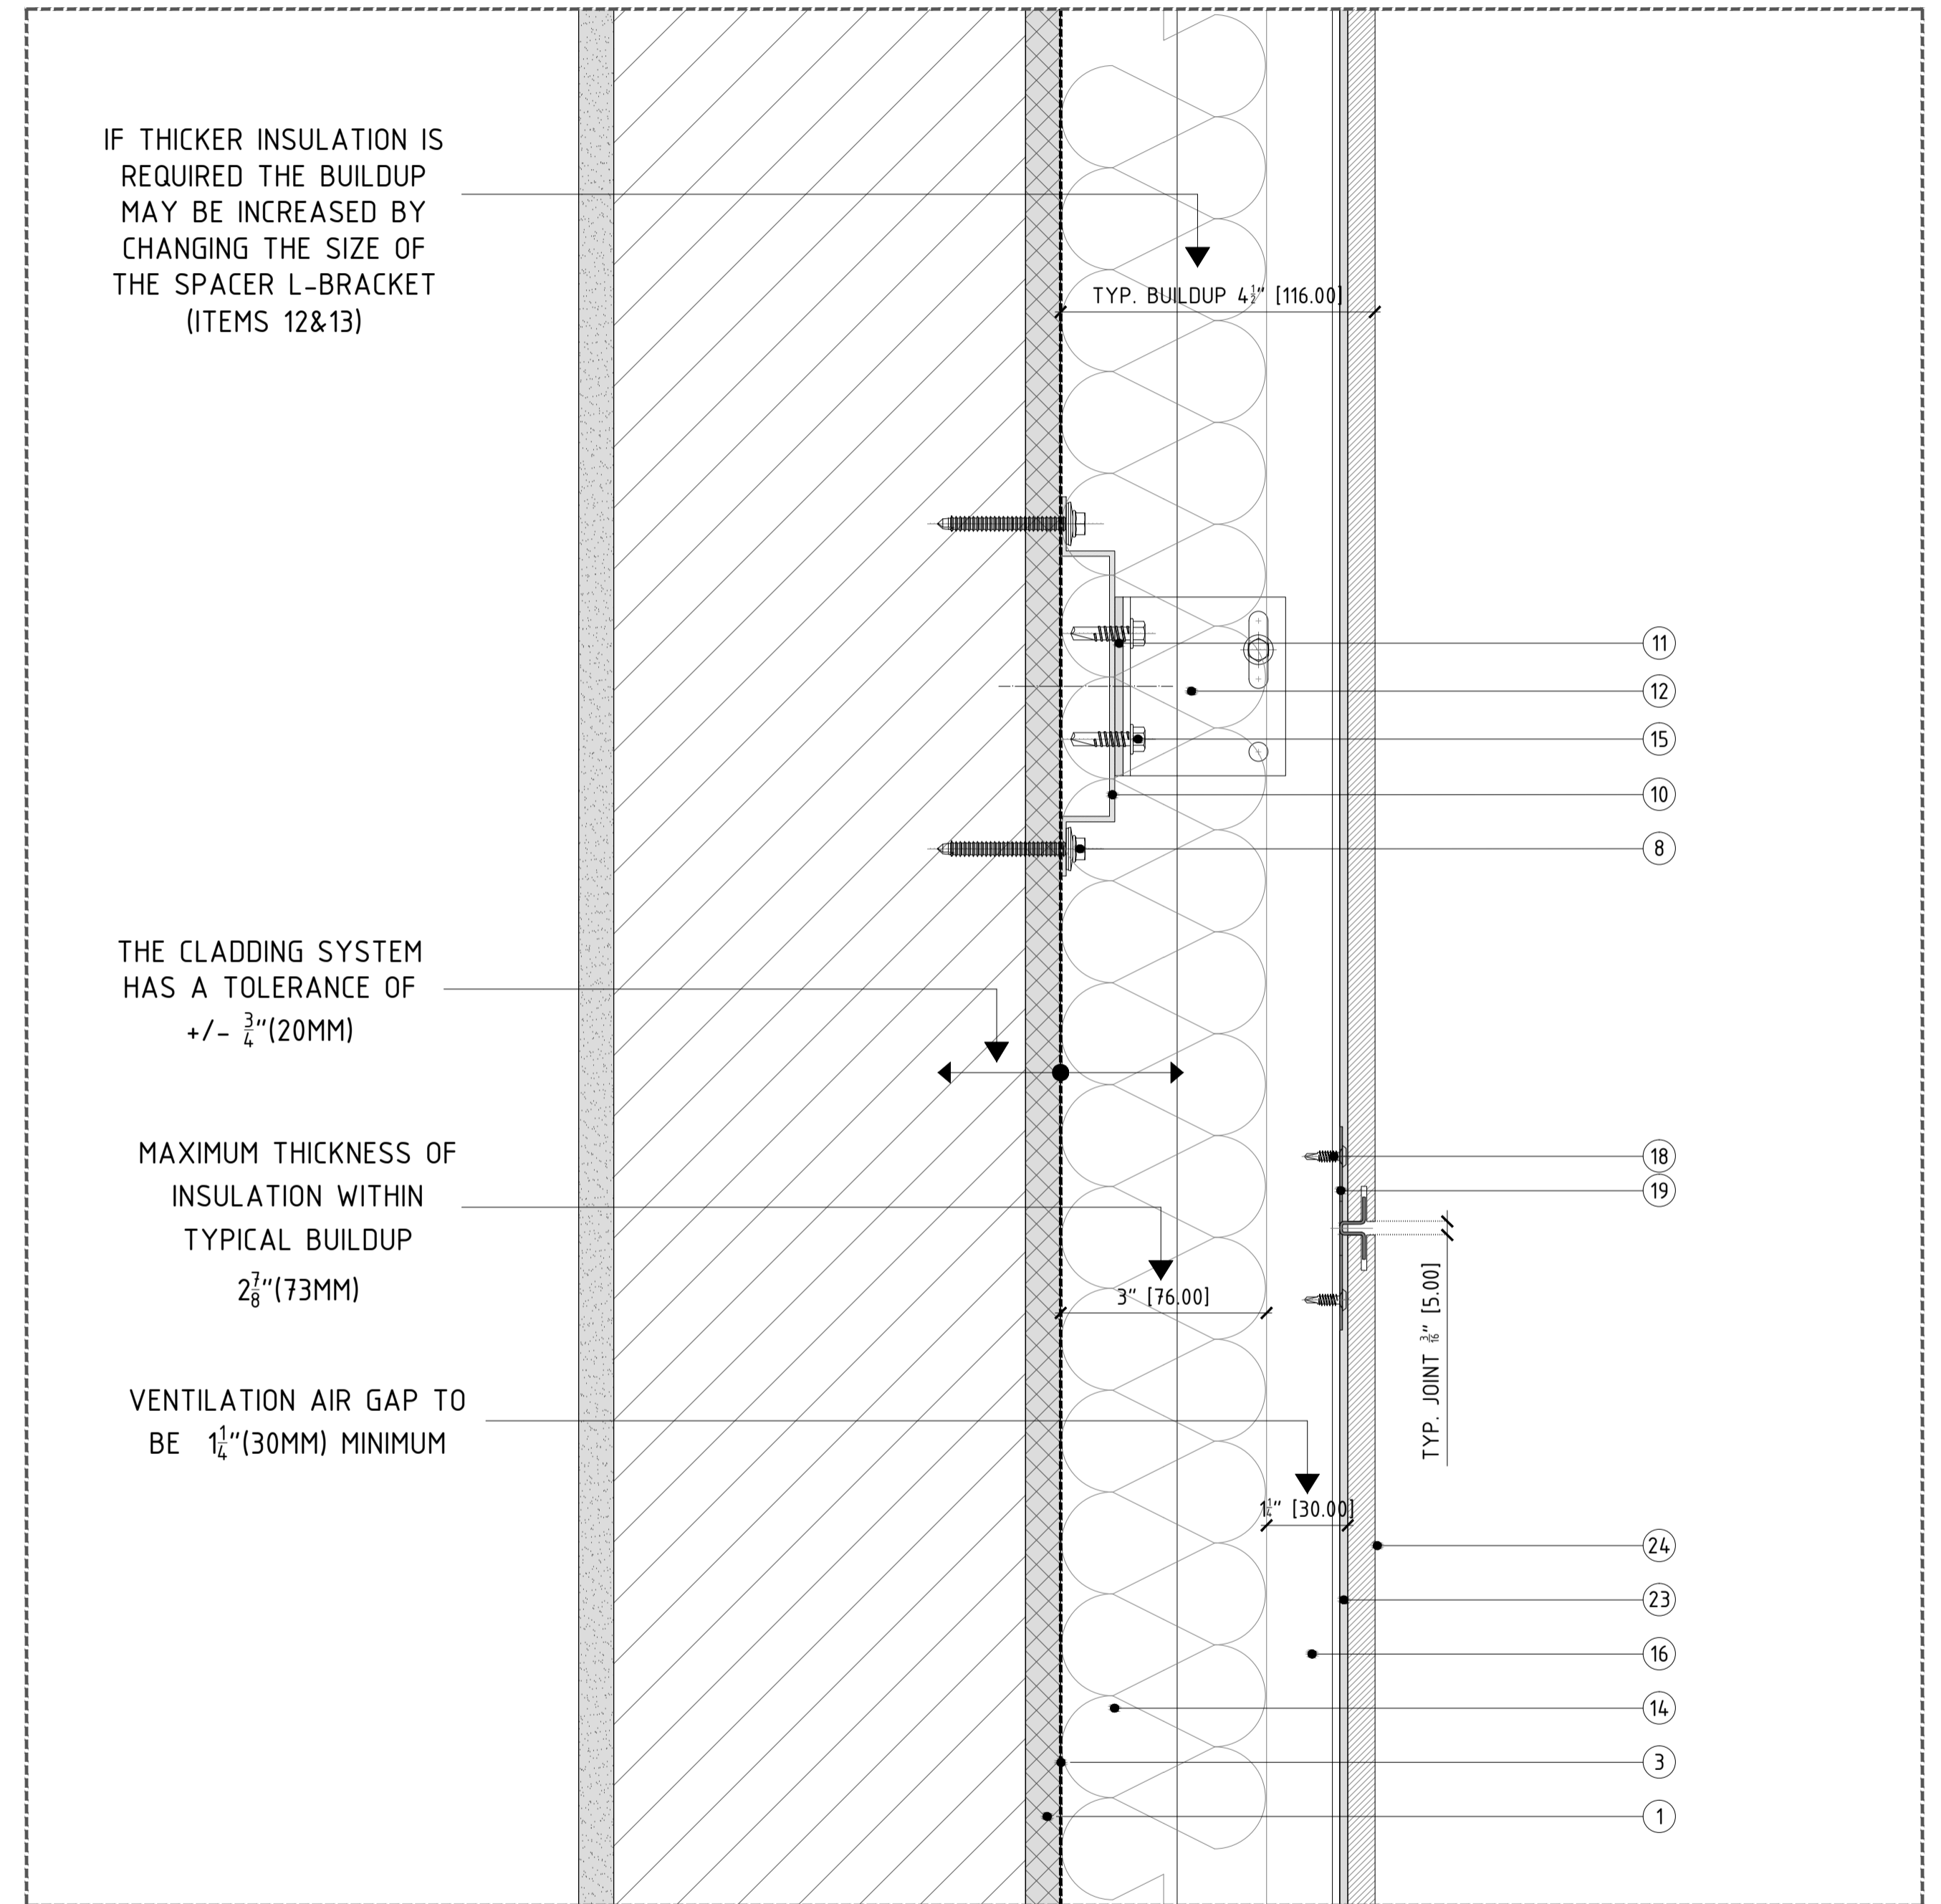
DETAIL A - TYPICAL HORIZONTAL DETAIL WITH STUD WALL
